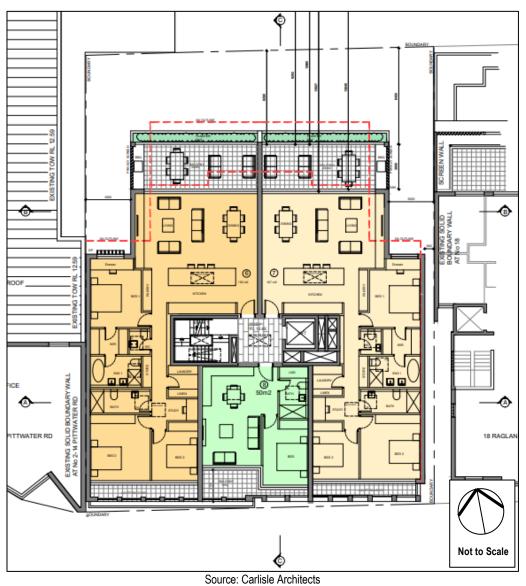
Approved Level 2 Floor Plan (To be Amended)
